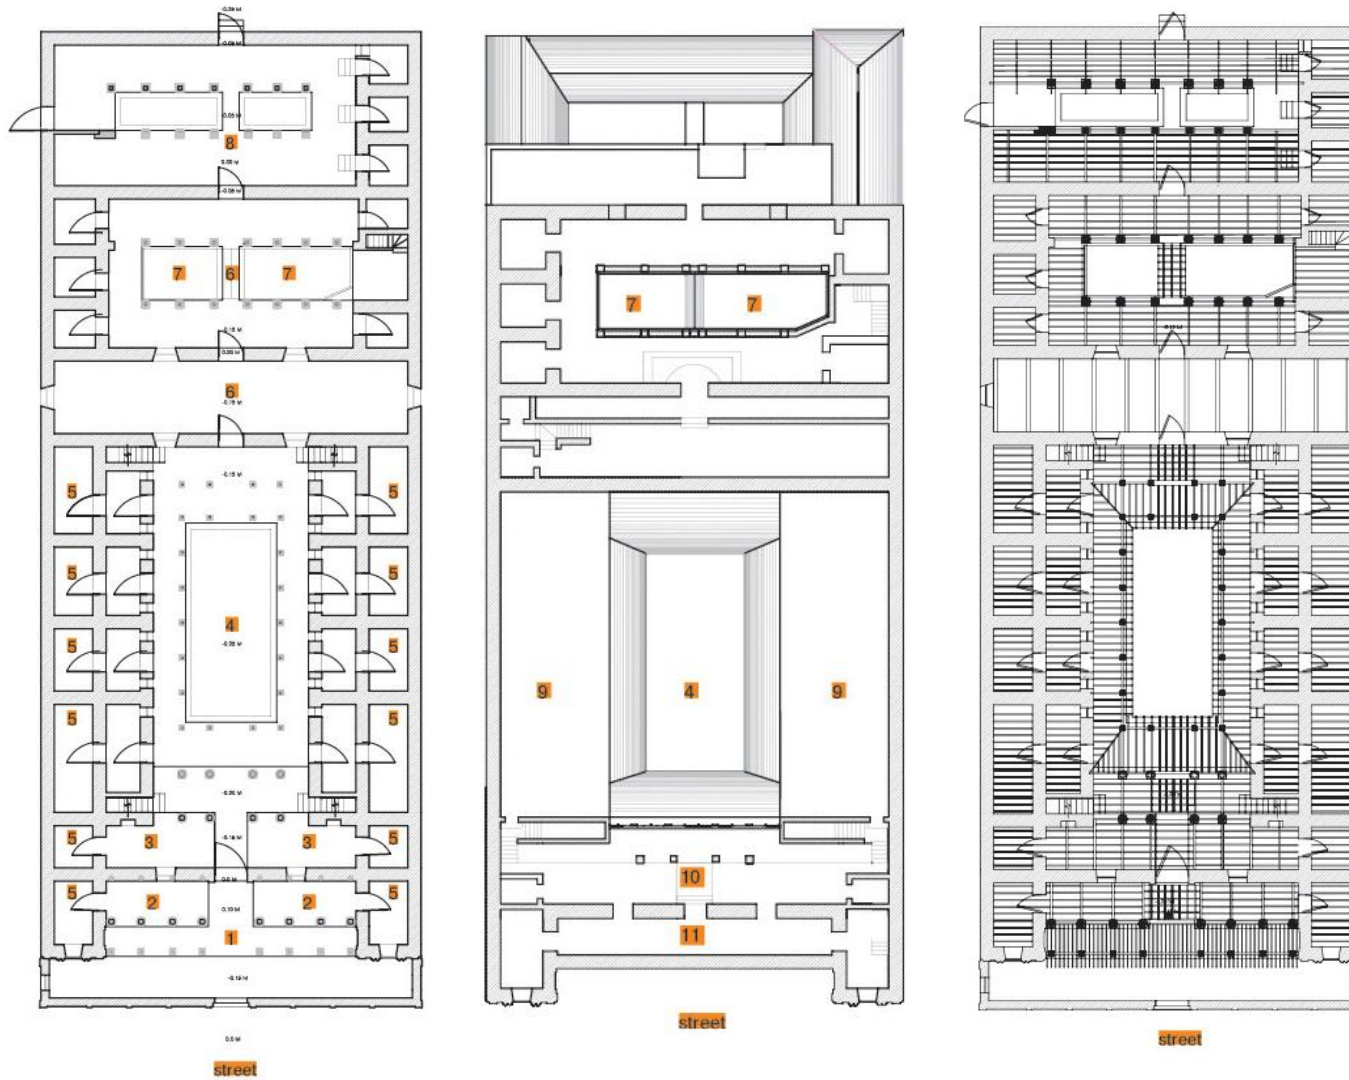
(From left to right) ground floor plan, first floor plan, reflected ceiling plan (ArchES and Sowmya Sudarsanam)
